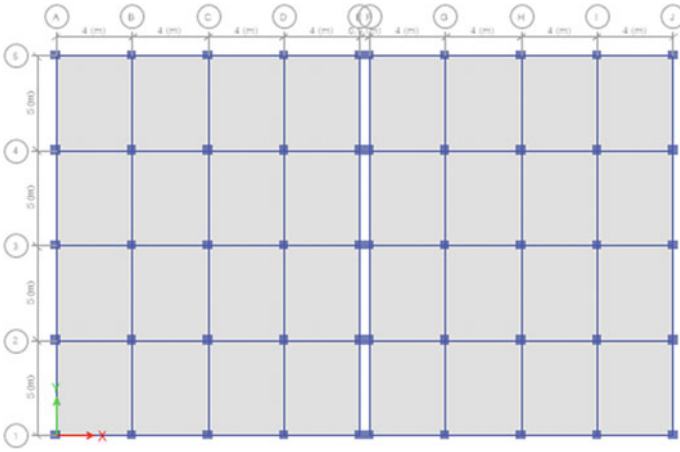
Plan of G+14 storied similar height adjacent buildings placed with seismic gap of 600 mm
